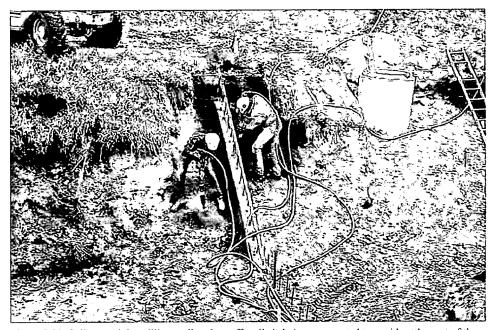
Soil around the stilling well and cutoff walls is being compacted to avoid settlement of the structure.
